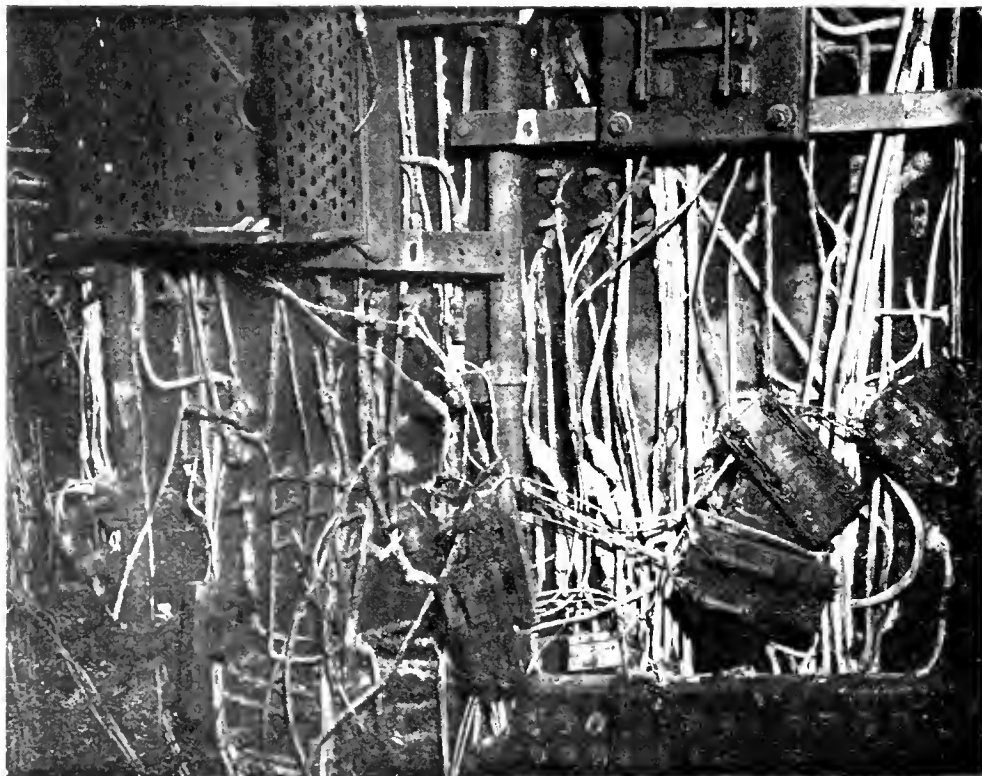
Kojimachi Substation—Rear view of switchboard which was located on second floor
